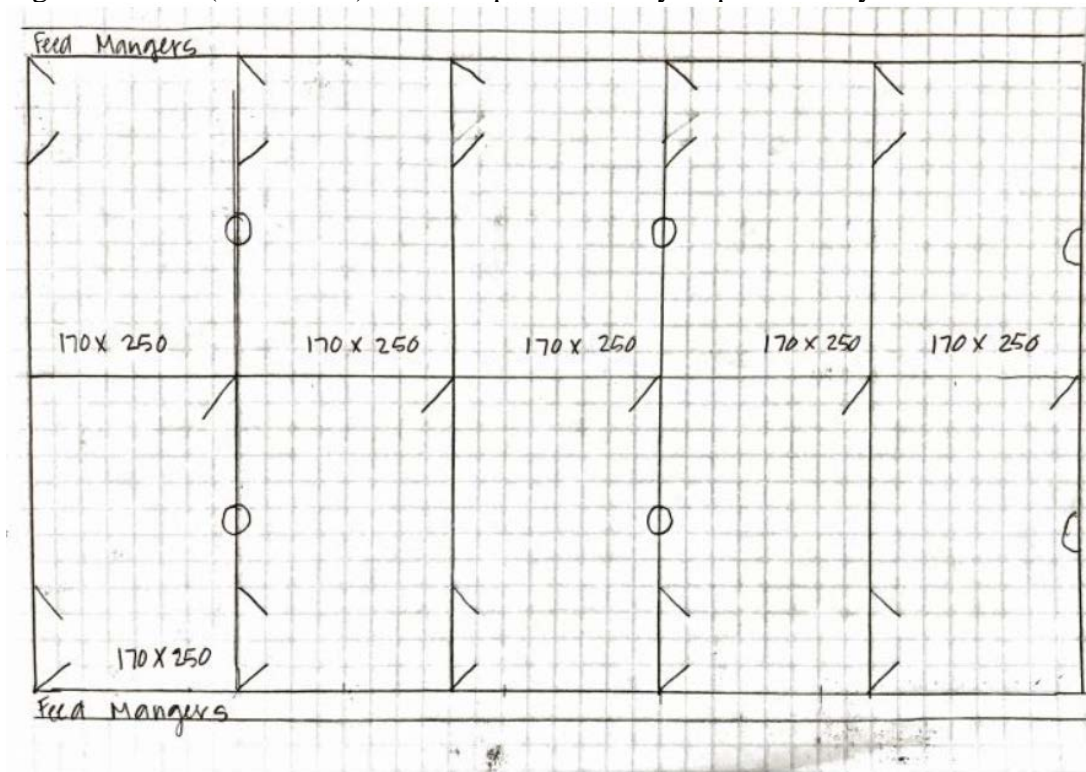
Wheatland ORC Schematic of Proposed Facility Layout.
